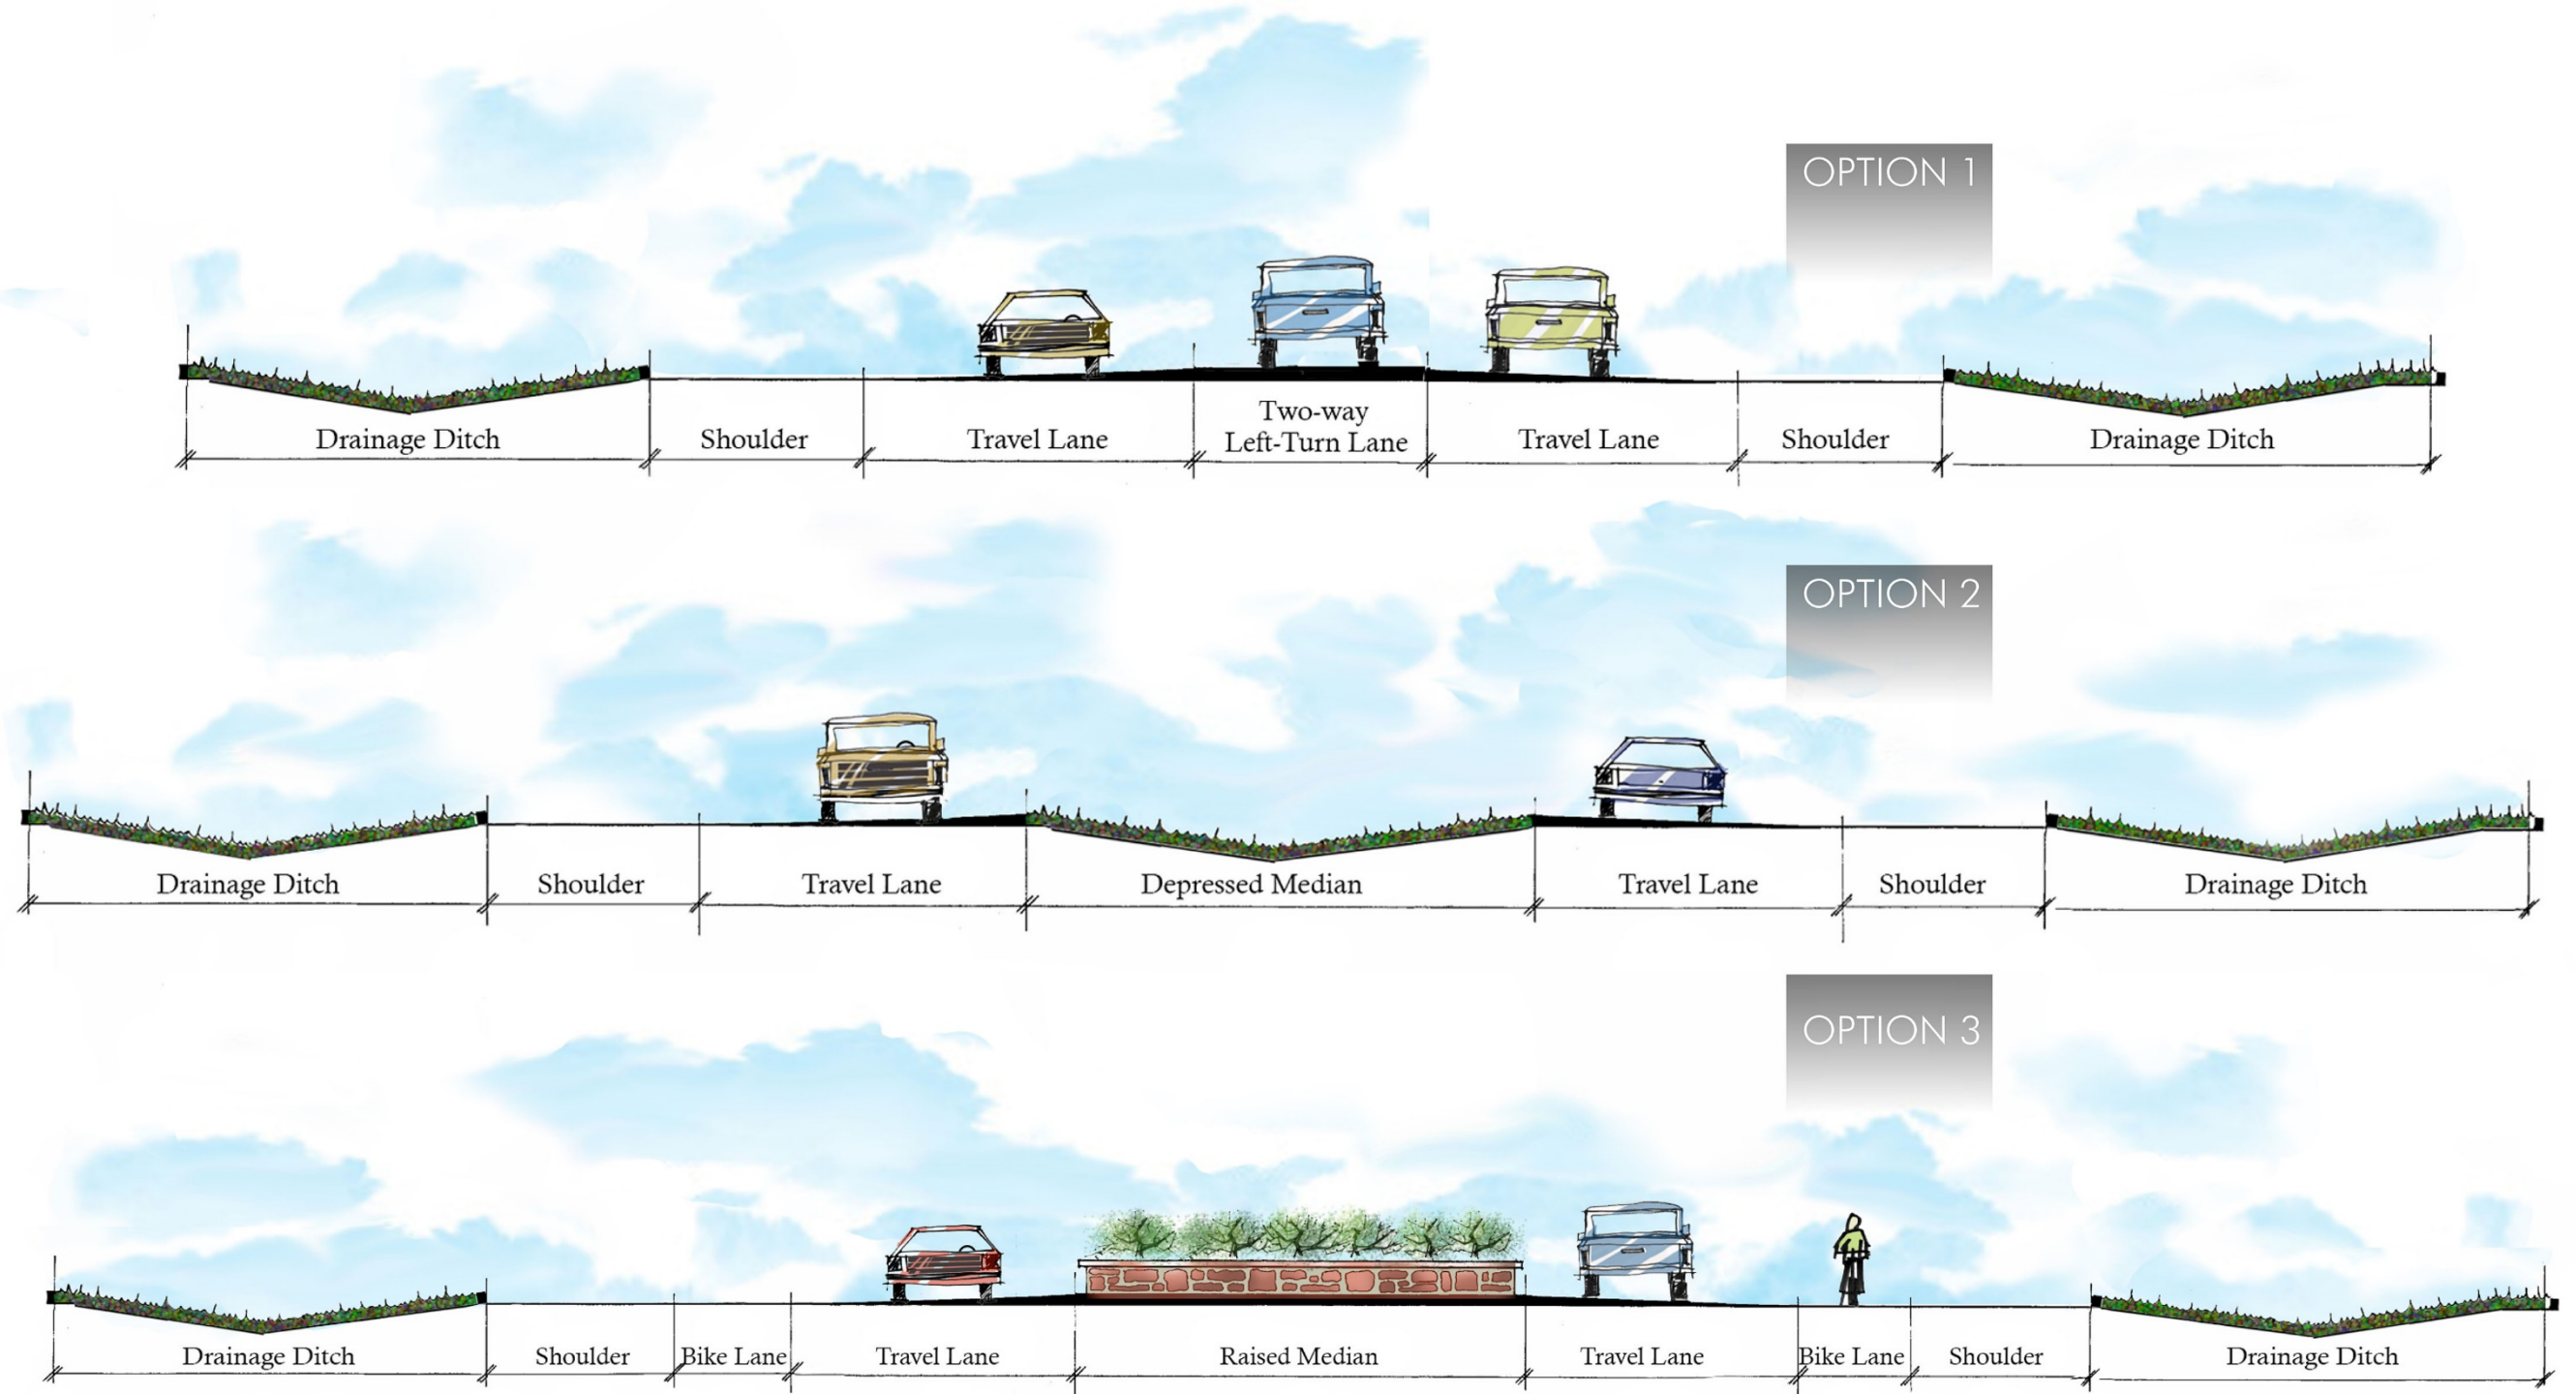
PROPOSED TYPICAL SECTIONS
